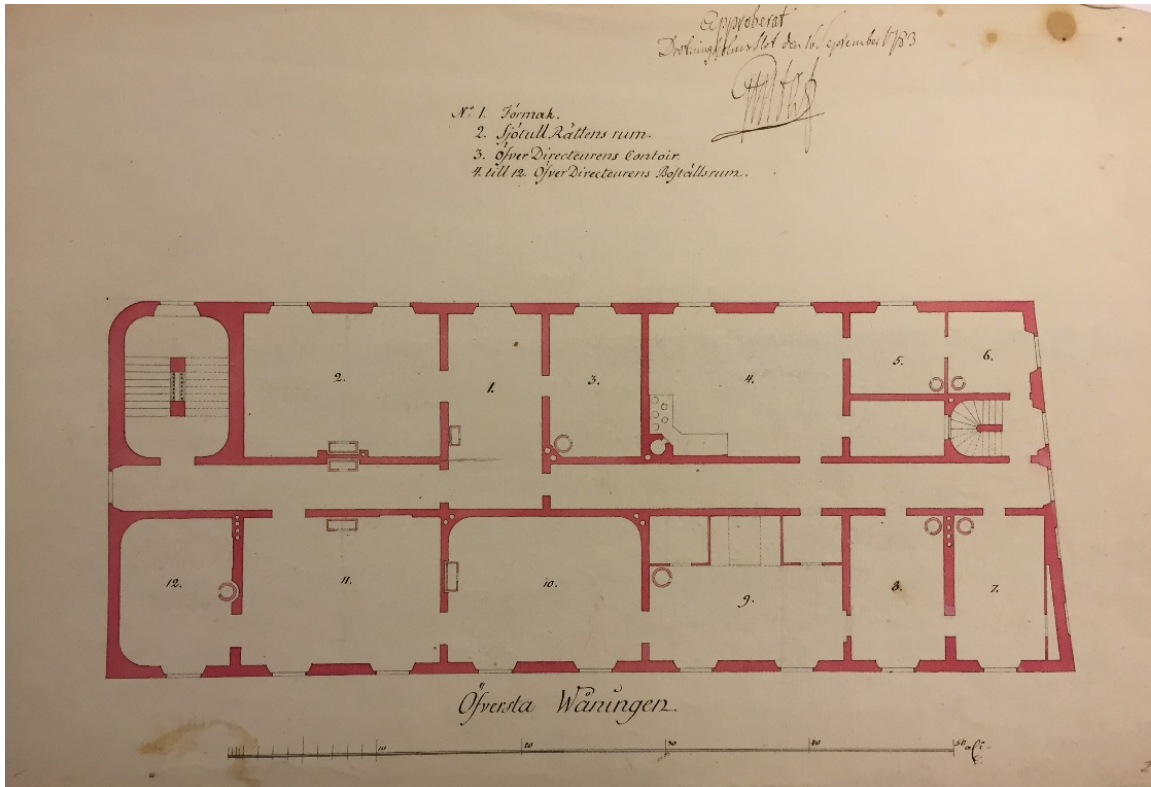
Floorplan of the Top Floor of the New Customs Office. 'Öfversta Wåningen', 1783, Kart och ritningsarkivet, Gamla Samlingen, Pack- och Tullhuset, 23:5, Stockholms Stadsarkiv.
